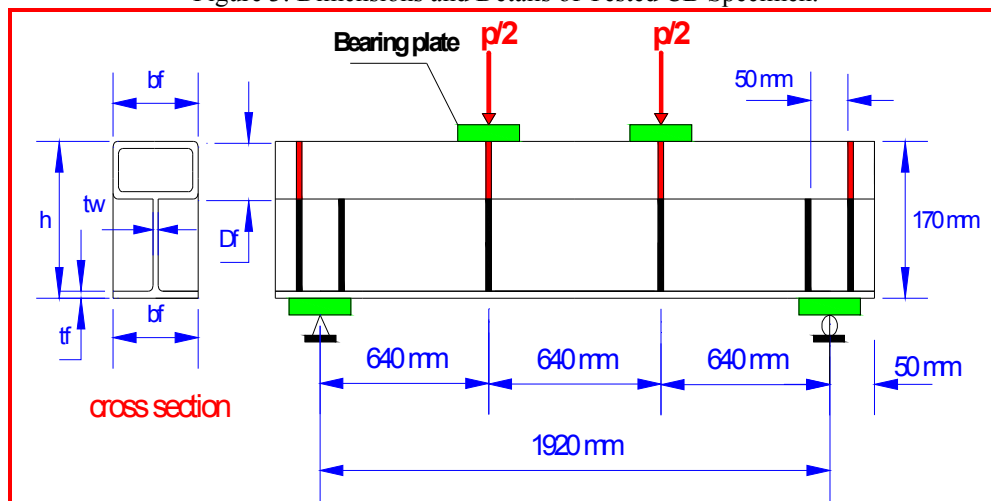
Dimensions and Details of Tested tubular flanges Specimens.
